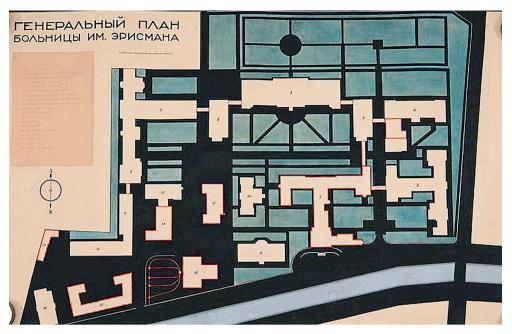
General plan of the Hospital named after F.F. Erisman [12]Рис. 14. Генеральный план больницы Ф.Ф. Эрисмана [12]
